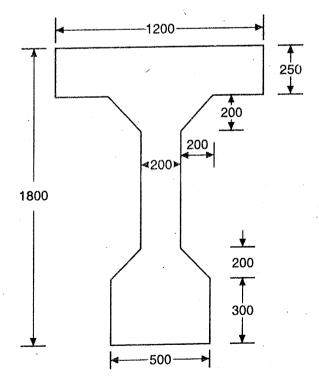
Cross Section of Prestressed Concrete Girder.
